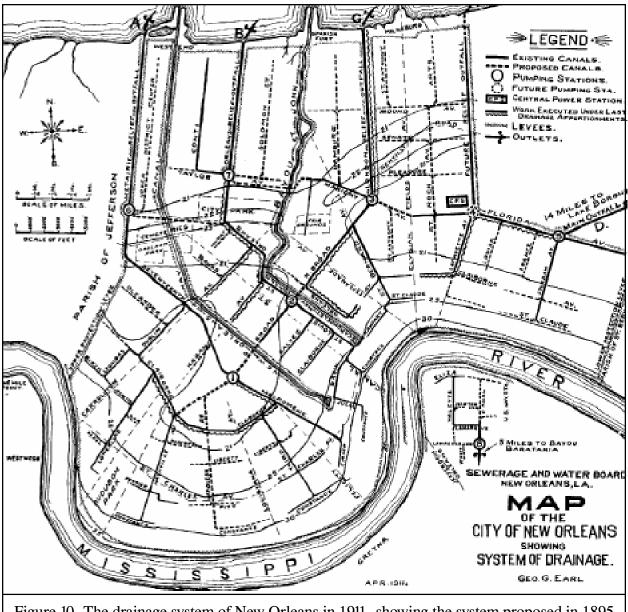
The drainage system of New Orleans in 1911, showing the system proposed in 1895 and construction to 1911 (from Sewerage & Water Board 1911).
